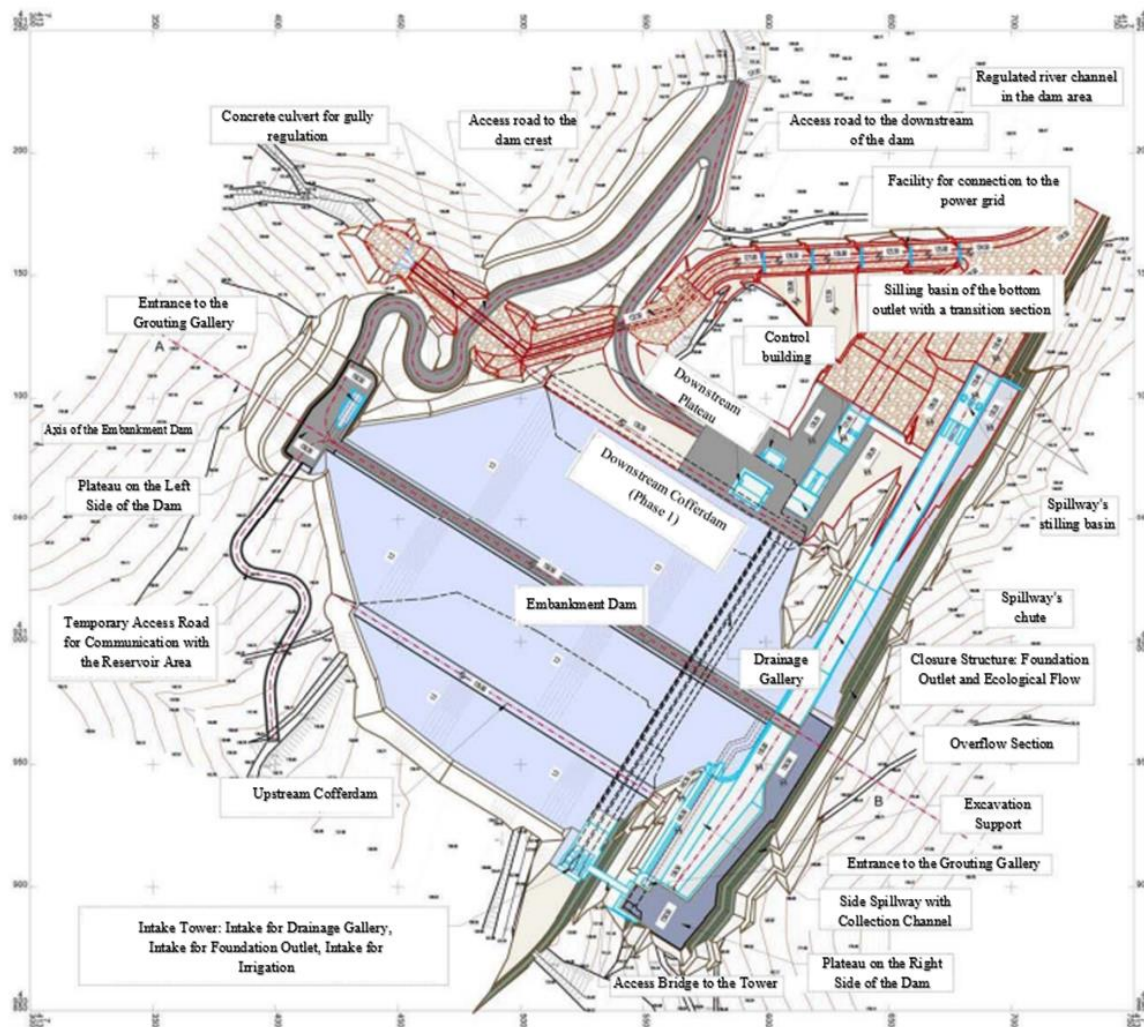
Layout of Pambukovica Dam (Source – Design for Construction Permit)
